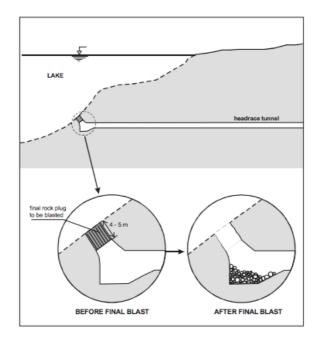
Illustration of the blasting situation for underwater tunnel piercing (Palmstrøm, 2002)
